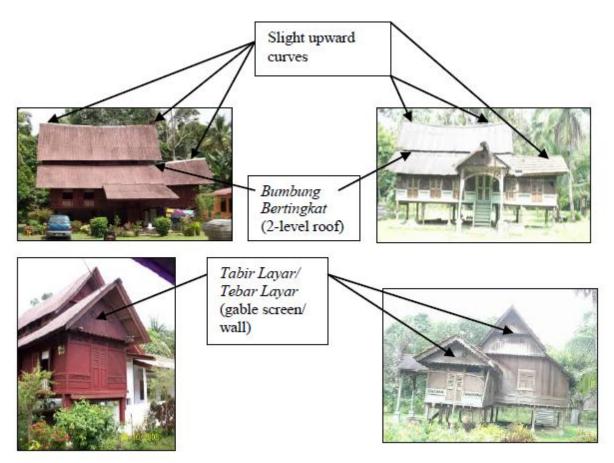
Photographs showing the context of the terms leveled roof and gable end (tabir layar)
